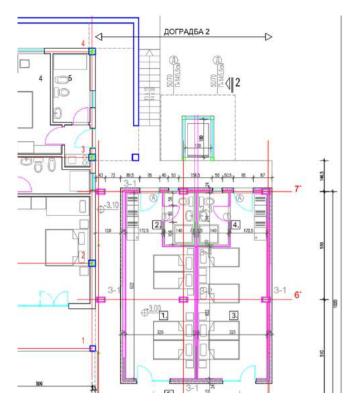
Design of the high basement in extension/addition to existing accommodation facility
